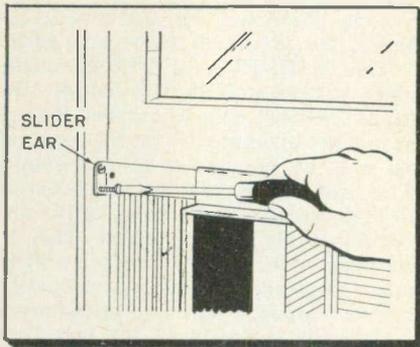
Two screws attach slider ears to window stop moulding on right and left sides of the conditioner.
